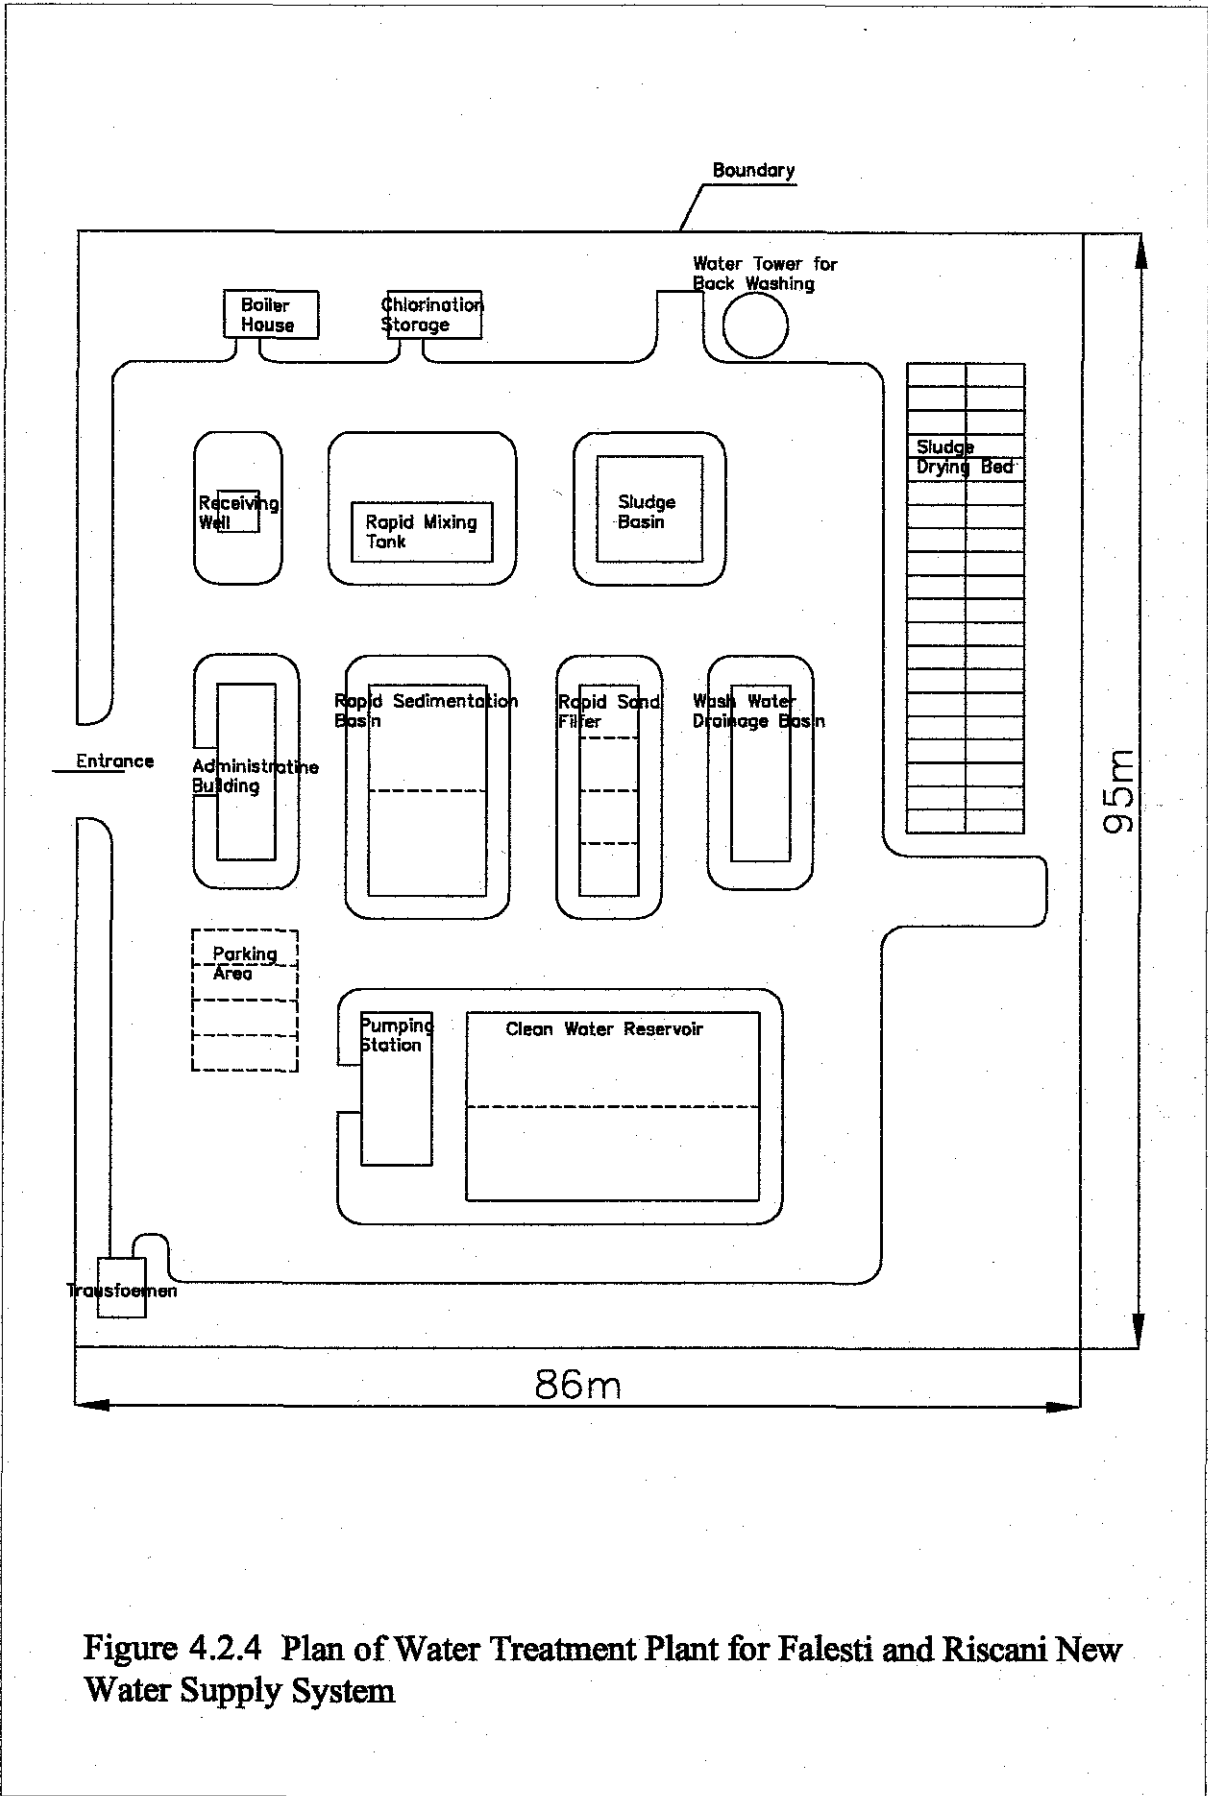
Plan of Water Treatment Plant for Falesti and Riscani New Water Supply System
